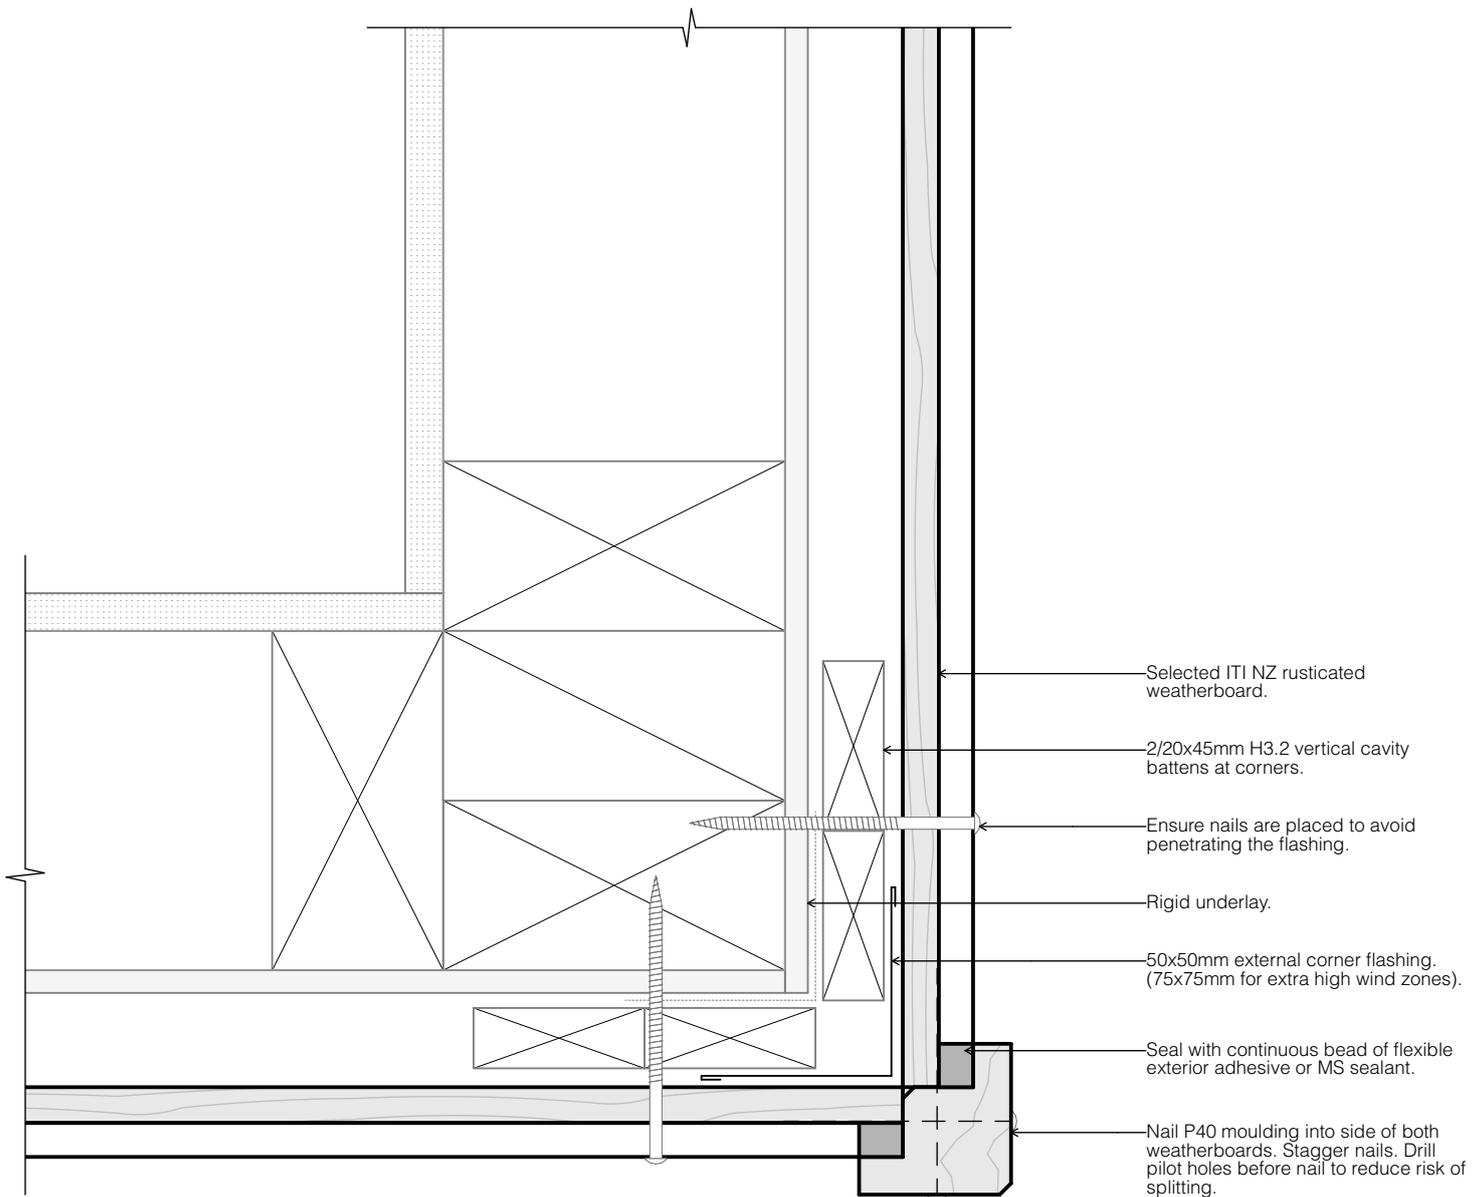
501 EXTERNAL CORNER – BOXED CORNER
